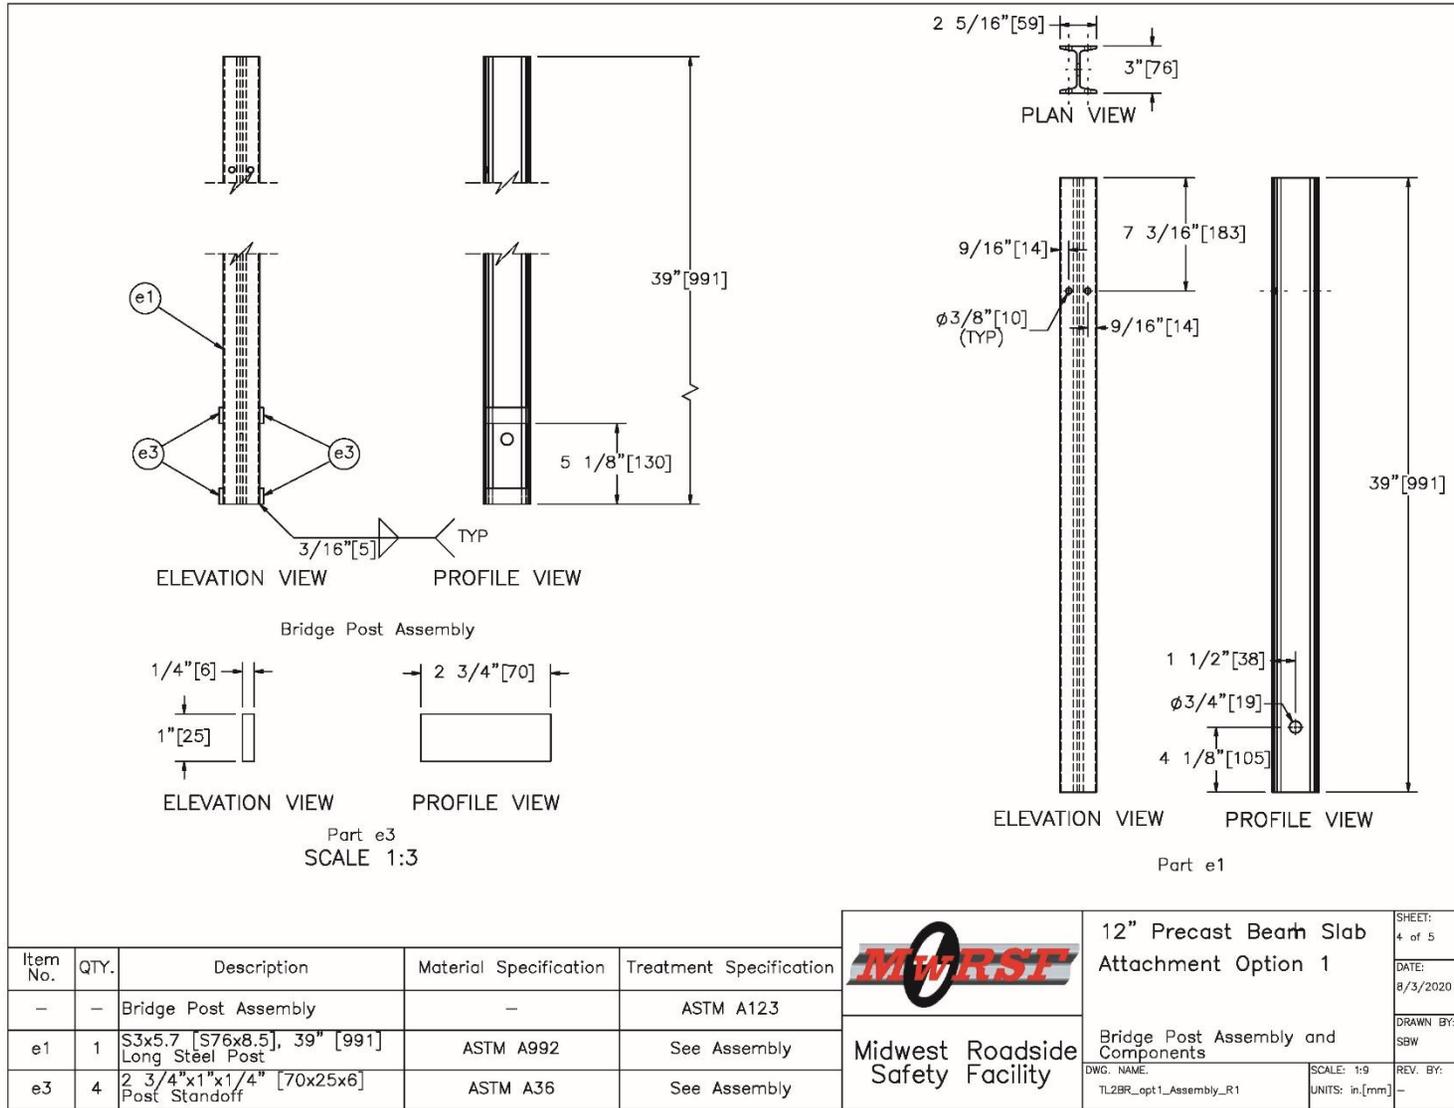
System Details, TL-2 Bridge Rail Attachment to 12-in. Deck, Option 1, Post Assembly
